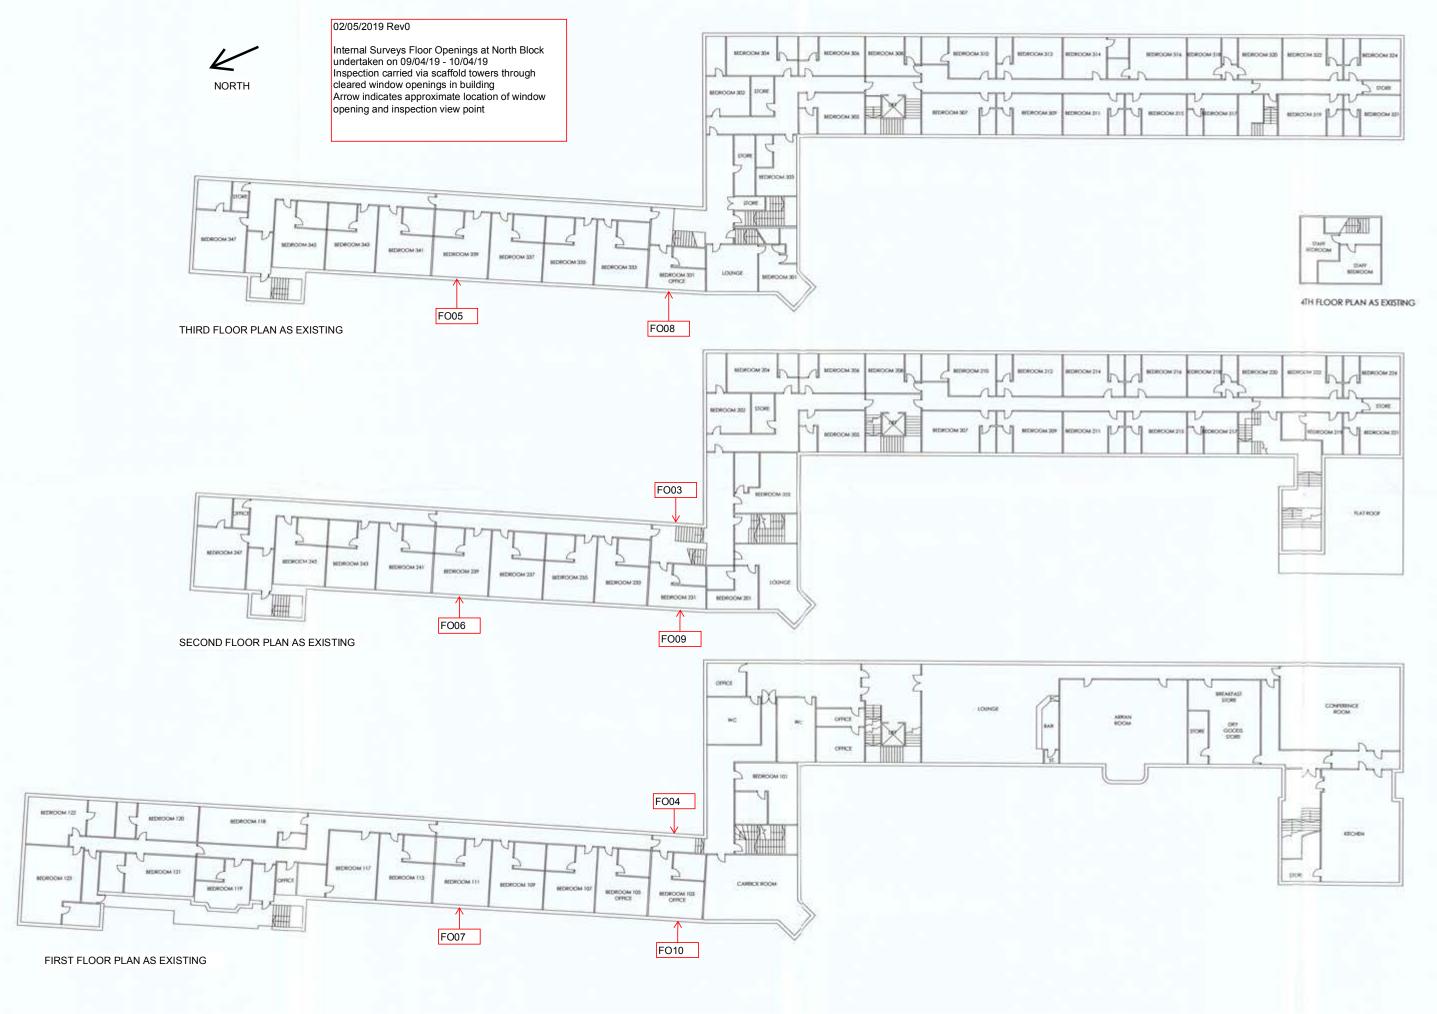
Plan of Station Hotel Building North Block 1st Floor, 2nd Floor and 3rd Floor/Mansard Roof showing Internal Survey Floor Openings (via scaffold towers) Defect/Observation Locations
